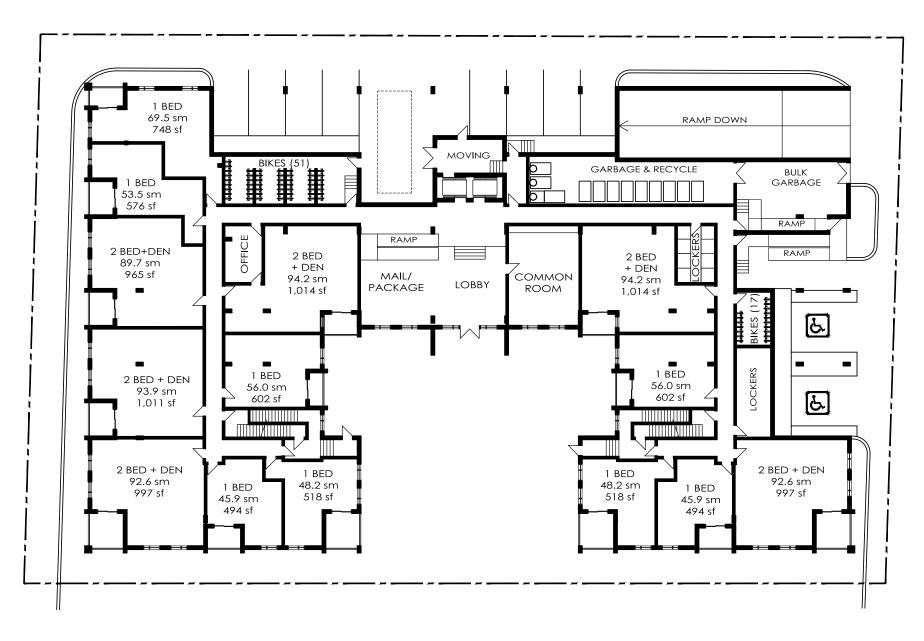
Ground Floor Plan prepared by Lintack Architects Inc.
